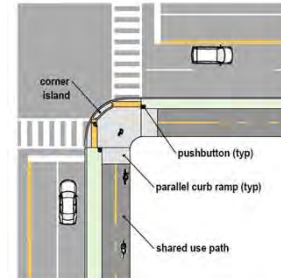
Side Path Curb Ramps at Constrained Intersection
